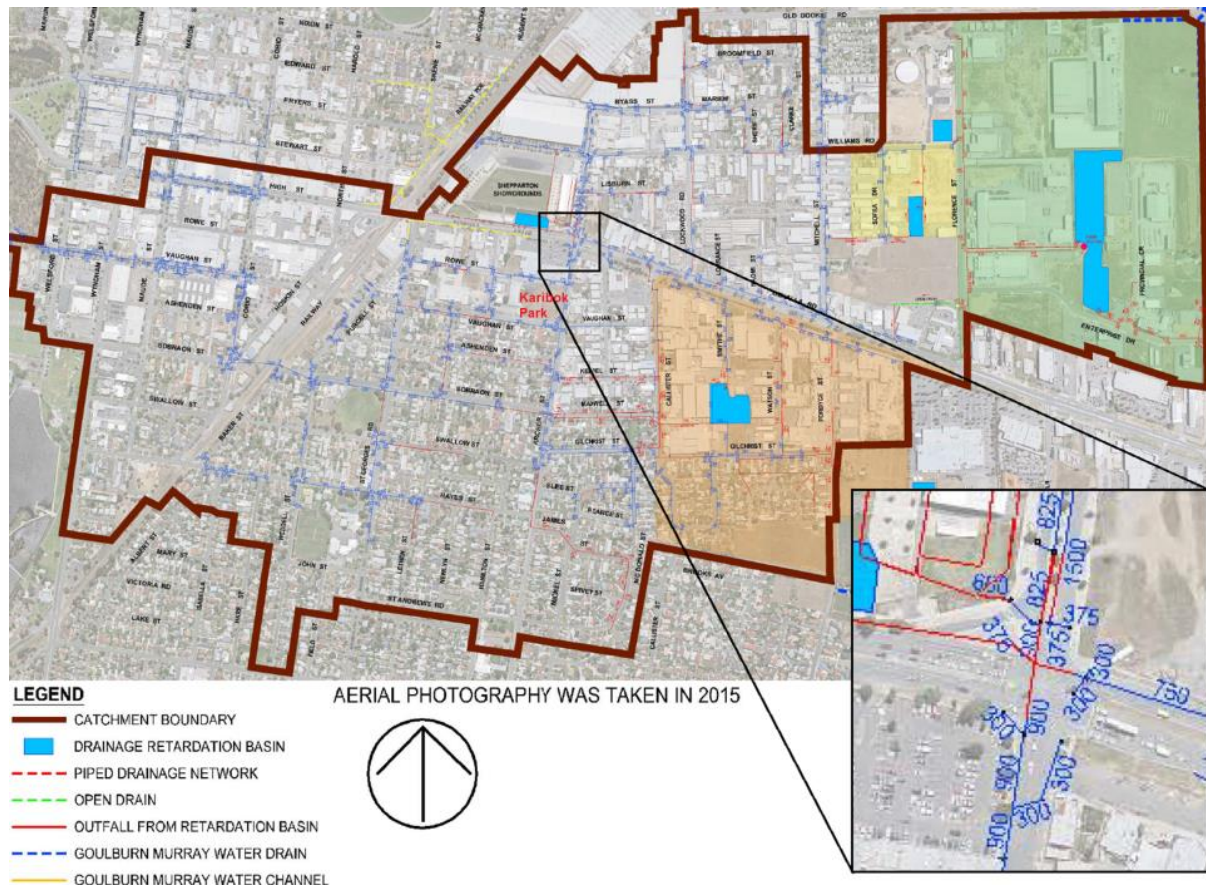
Sobroan St drainage catchment boundary and underground drainage pipe network near Karibok Park
